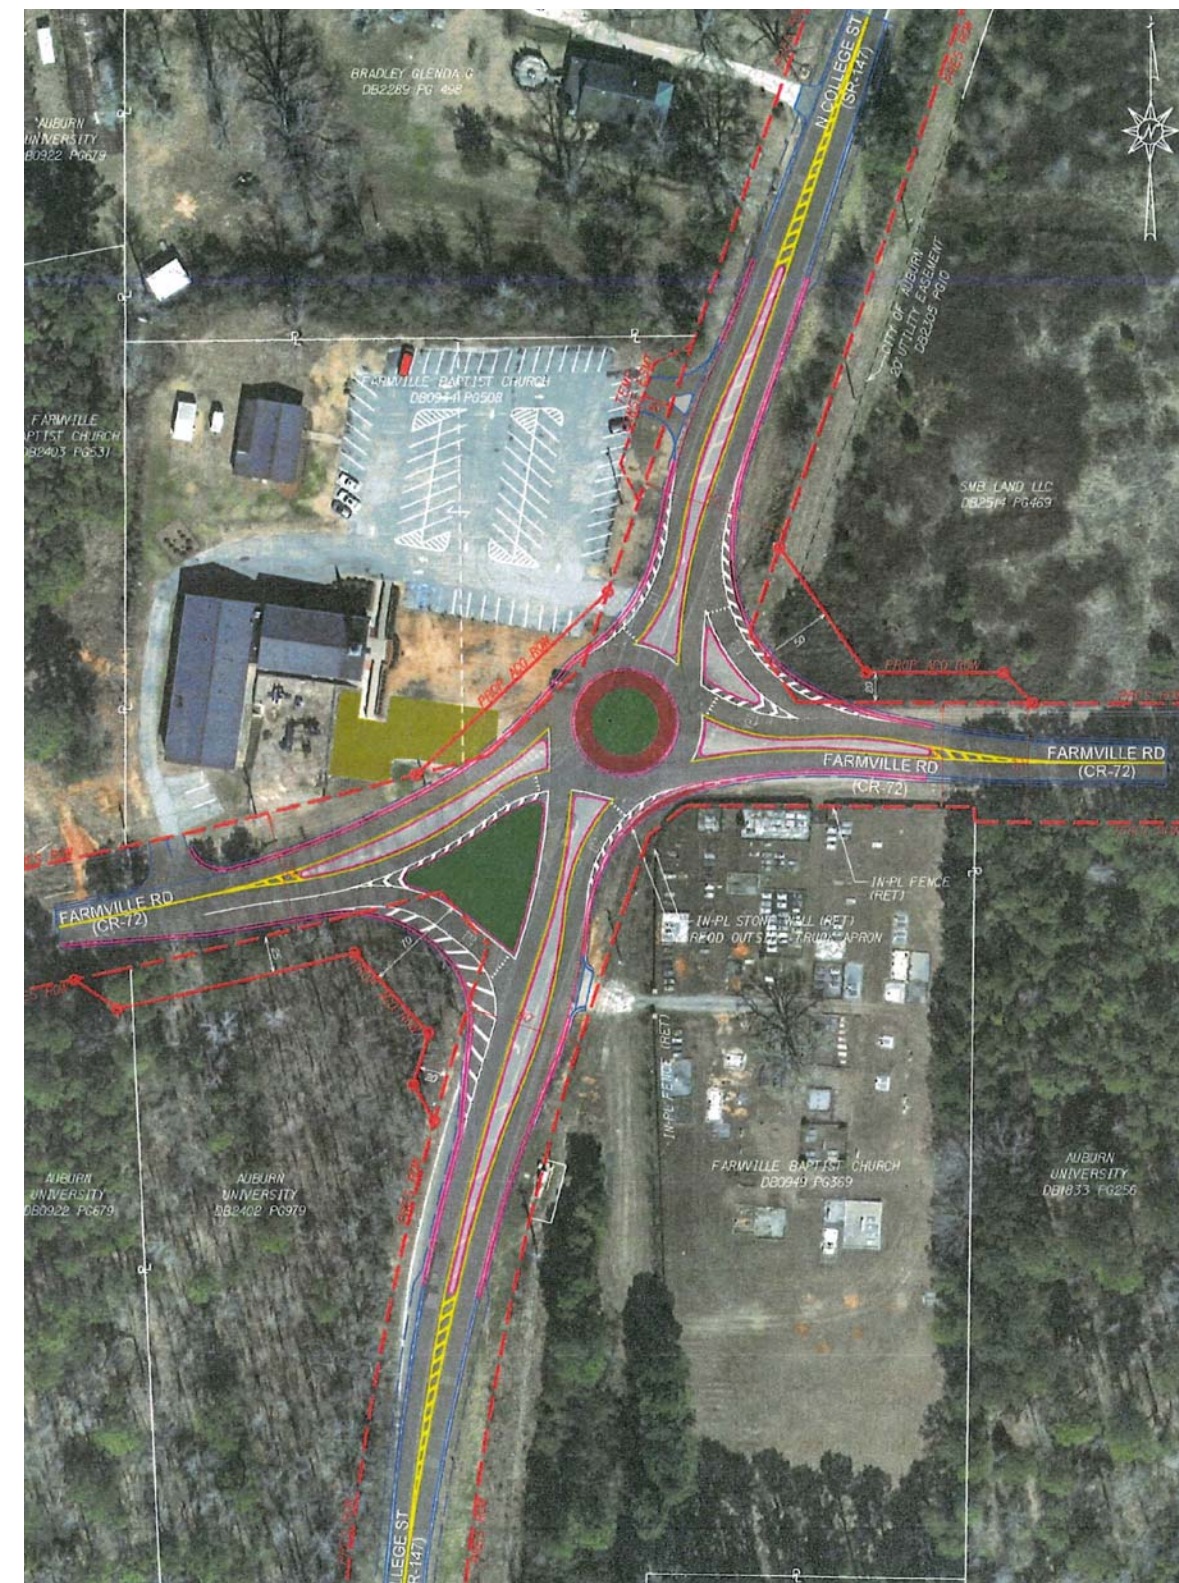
ALDOT Roadway Improvement Project - North College Street at Farmville Road
